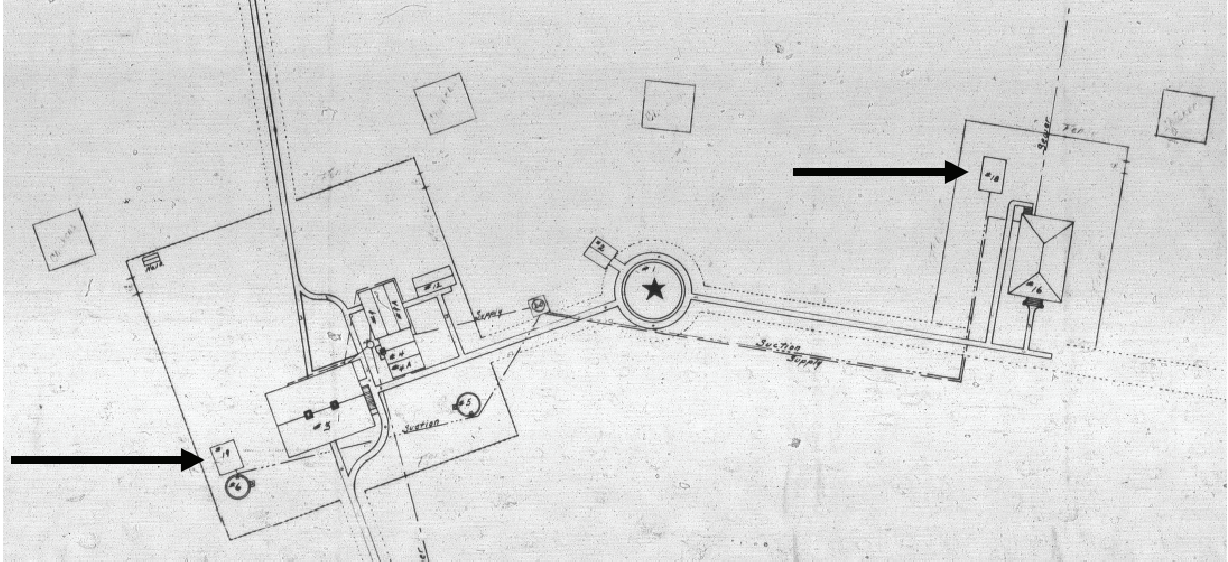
Close-up of 1925 Station site plan showing location of concrete cisterns.
